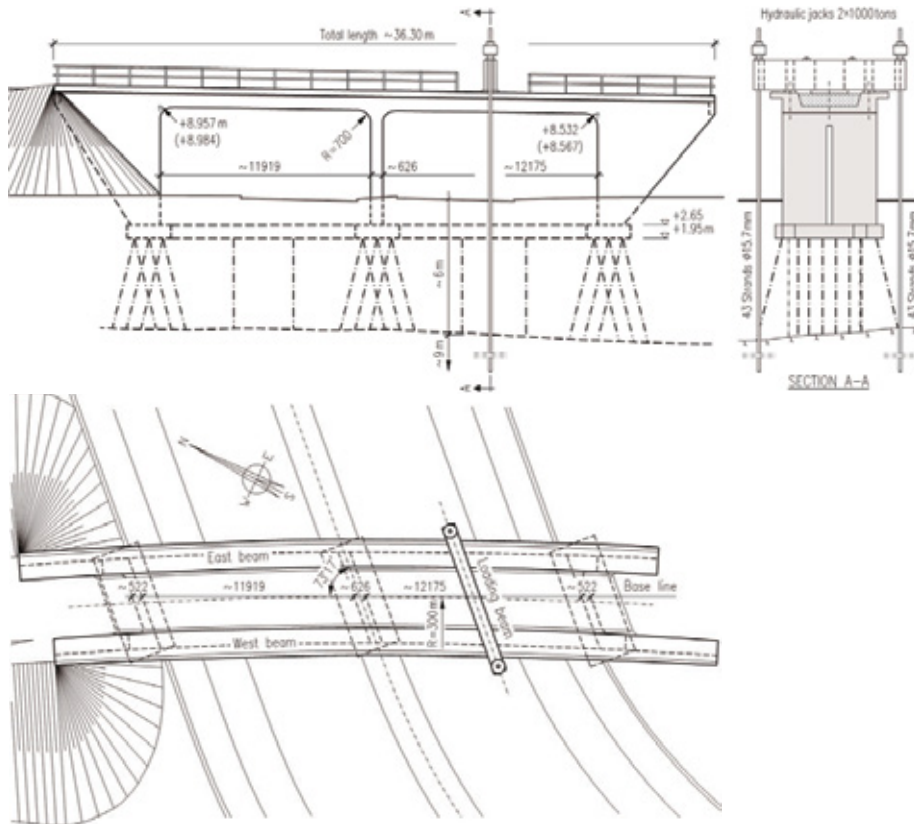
Elevation, plan and section of the bridge together with the loading arrangement [mm]. The South landfill was removed before the test.
